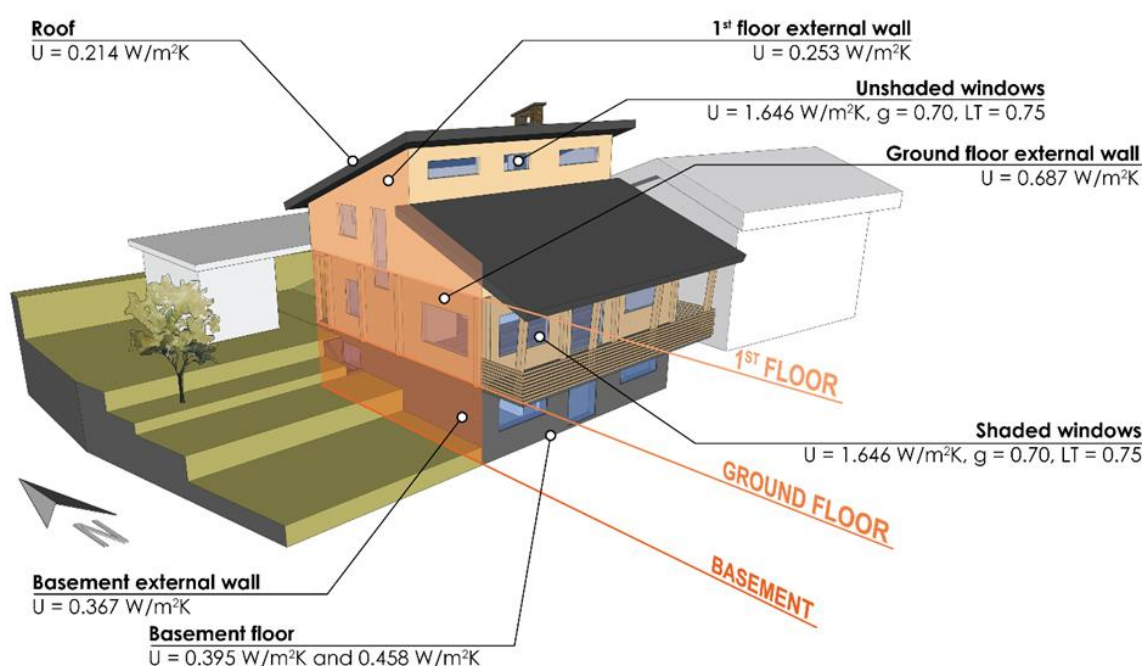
Studied log house model, with key characteristics of building envelope elements and its surroundings
